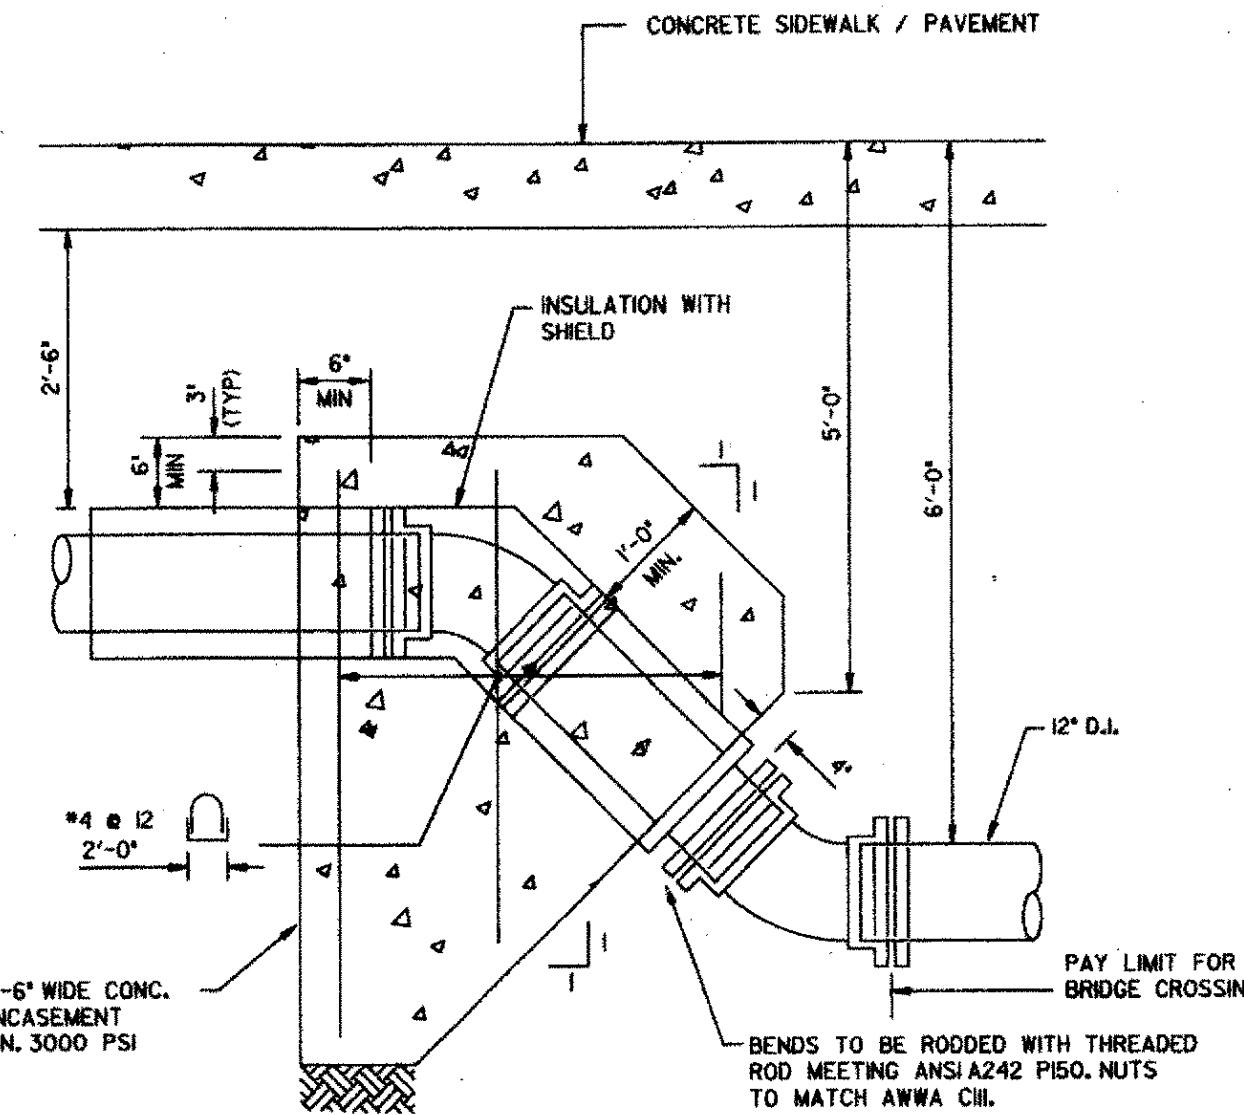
DETAIL OF INSULATION AT JOINT FOR RESTRAINED PIPE
